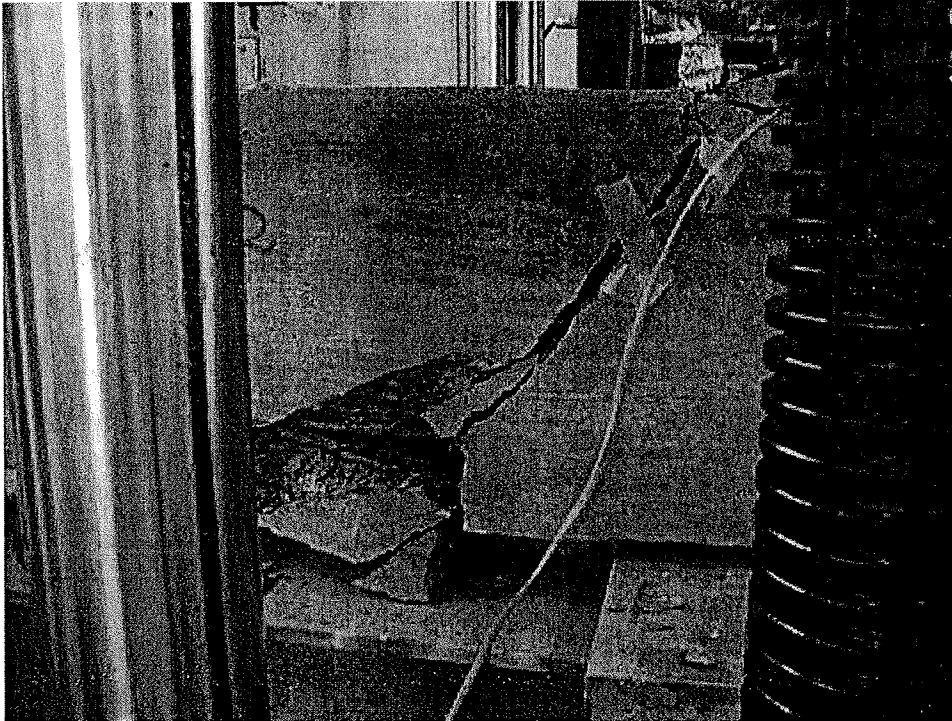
BRC-6 beam with flexural crack. LVDT's are also seen.
